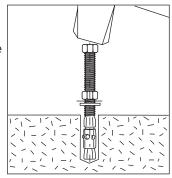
Floor Anchor Attached to Stile - 3D Top Side View.
